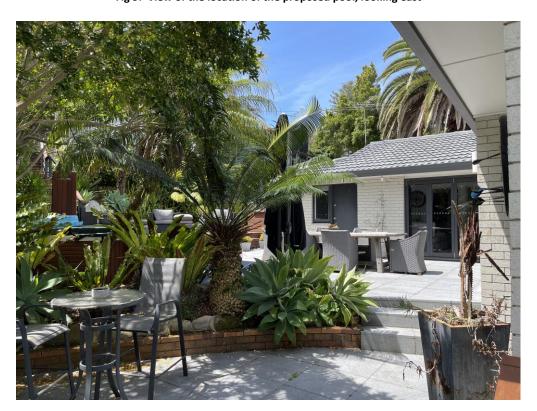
View looking north-east towards the location of the proposed roof cover the rear patio
